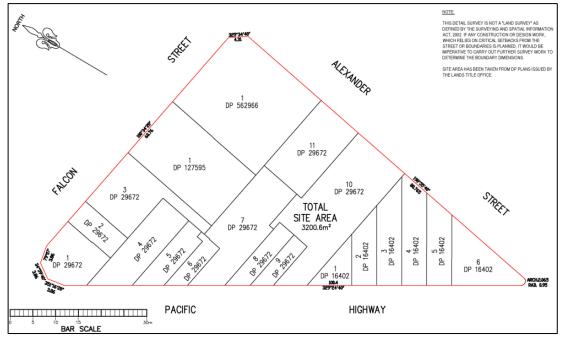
Site survey (Source: planning proposal, Gyde March 2023)
